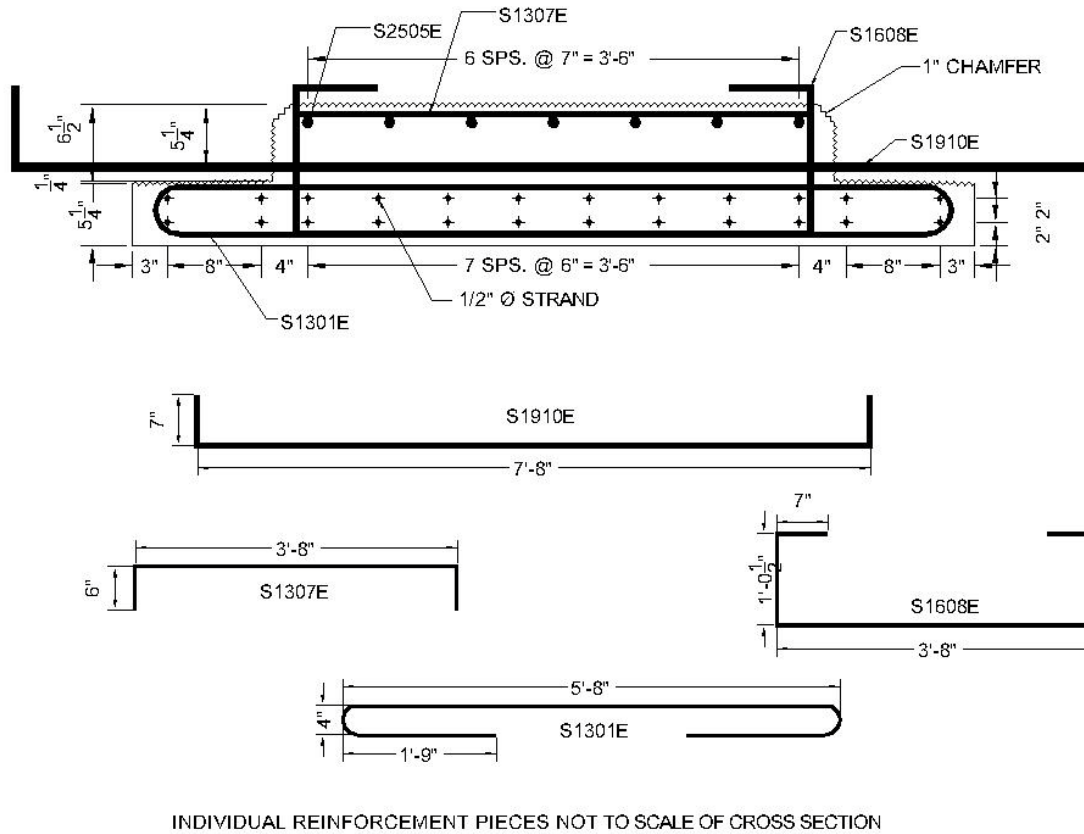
Cross section and individual reinforcement details for midspan of precast beam 2N
